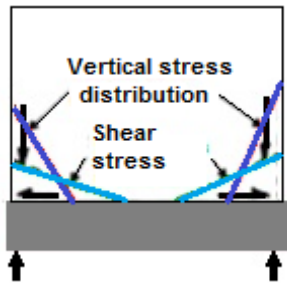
Model of wall-beam assembly with vertical and shear forces in beam, [8]
